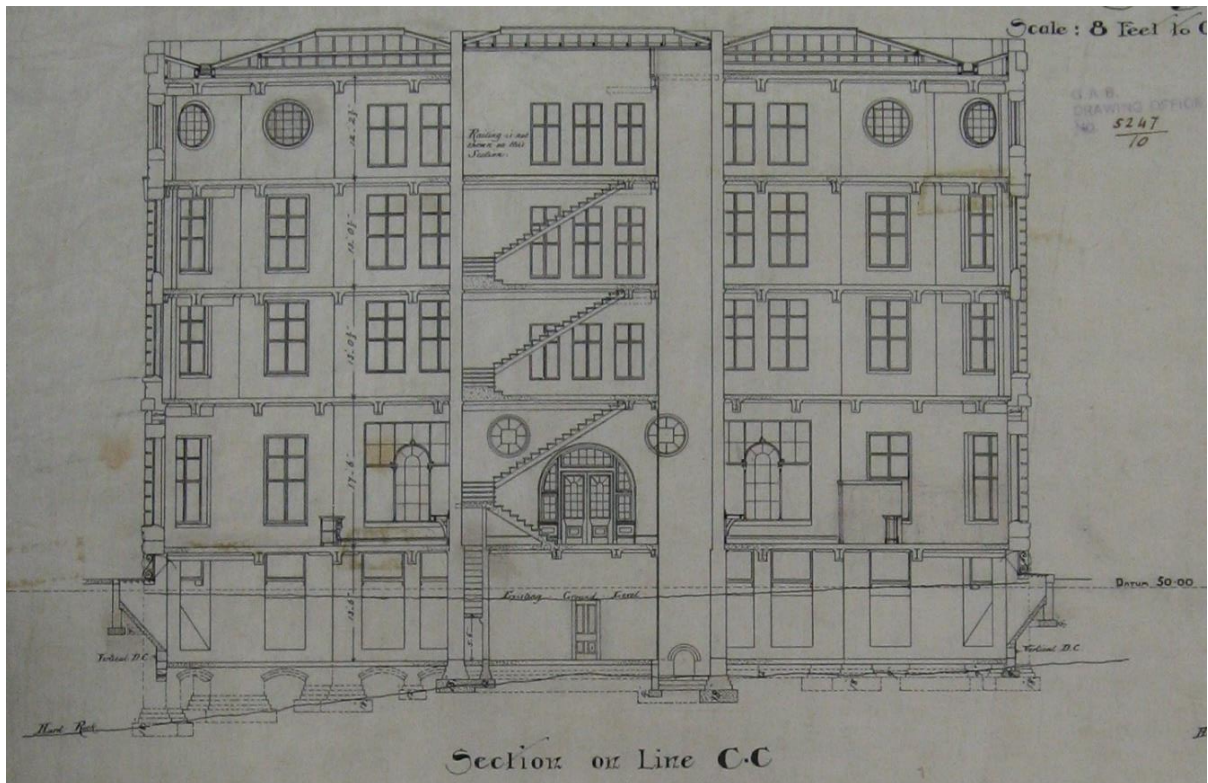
Detail from Sheet 5, Section on Line C-C: New Parcels Post Office Premises at the Central Railway Station Sydney, 1910 (showing the original four storey elevation).
